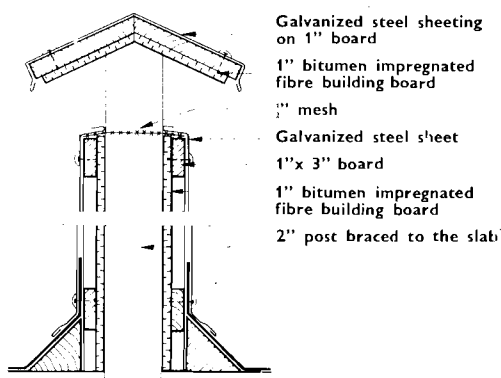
An air chamber between the wall opening and ventilation system could possibly solve the problem with wind and snow.
